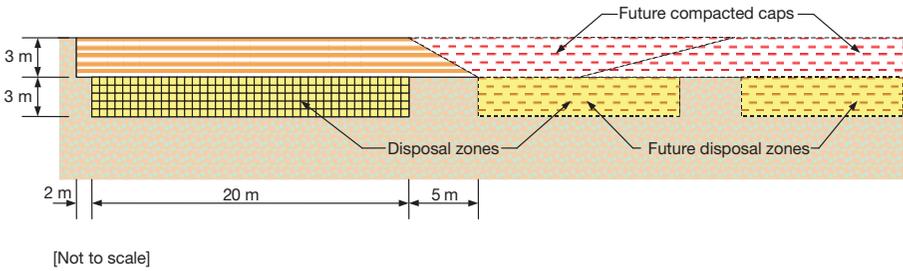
Vertical cross-section through new LLW trenches, showing the existing disposal zone and future extensions.
